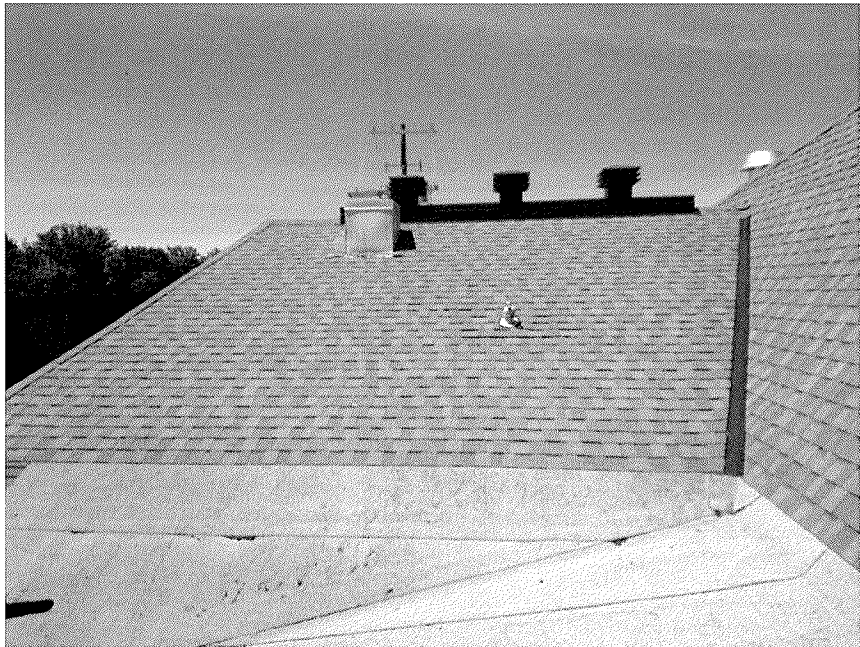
East roof field of south mechanical room, transitioning to mod-bit roof over spa addition.
